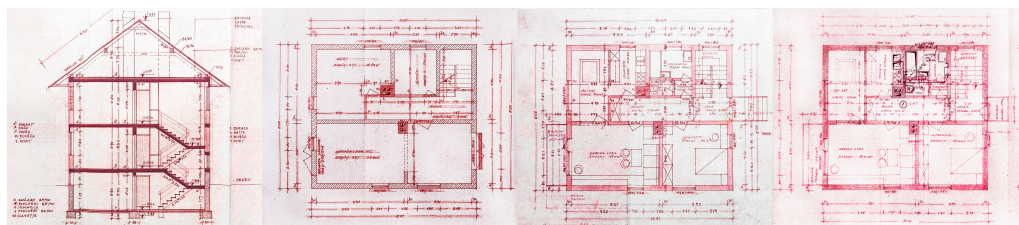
An example of a house located in Hrastje, Kranj, showing sections and floor plans—drawings collected on-site, donated by the owner. Obtained by Ana Belčič in 2021.
